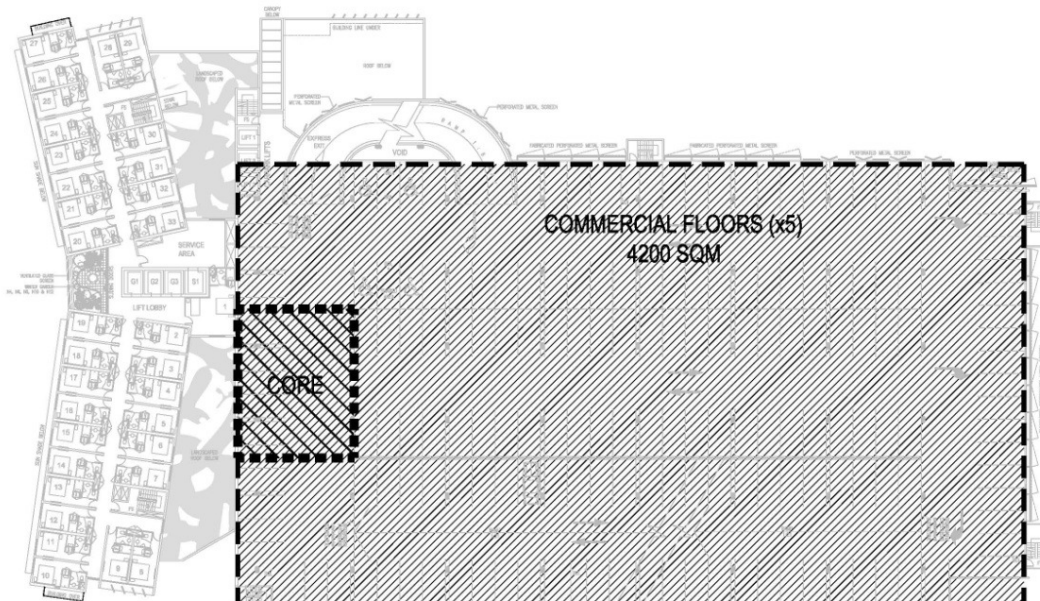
Floor plan for a possible hotel and commercial development overlaid on the current proposal.
